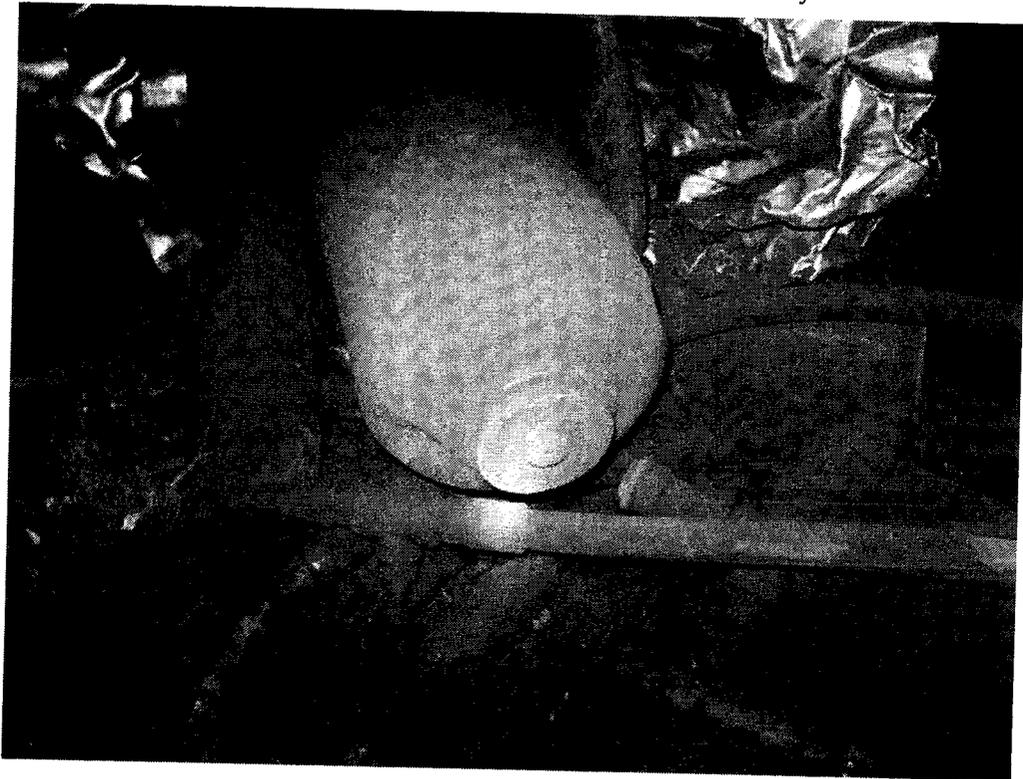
Outby segment of roof strap at A Left No. 3 Seal
